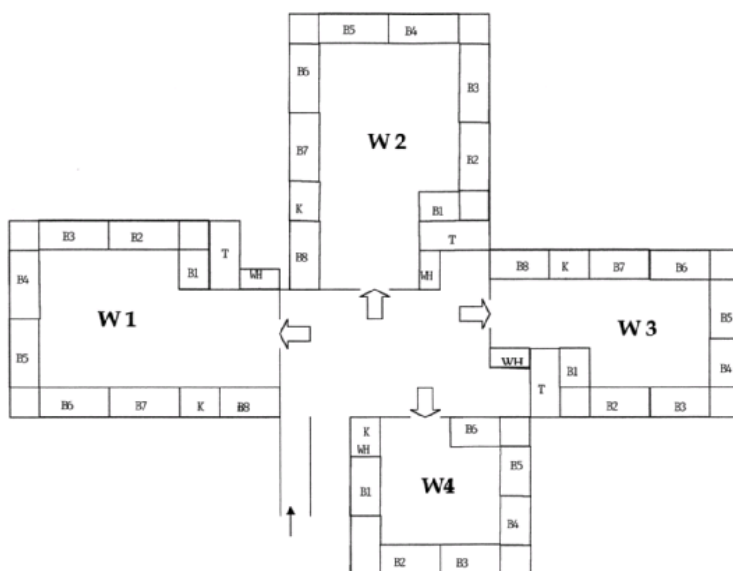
A typical building plan (W1, W2, W3 and W4 are wings 1, 2, 3 and four respectively).
